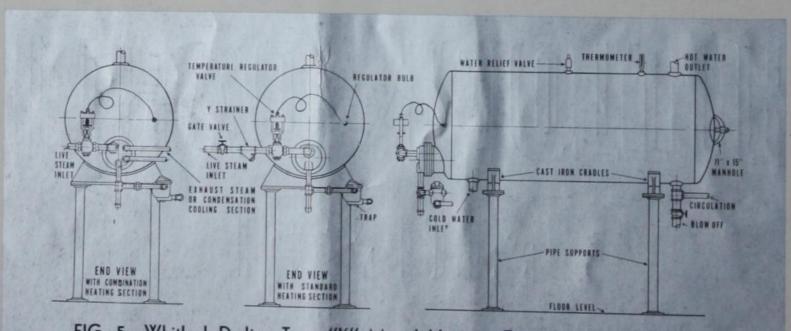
Whitlock-Darling Type "K" Monel Heaters-Typical Installation Layouts
